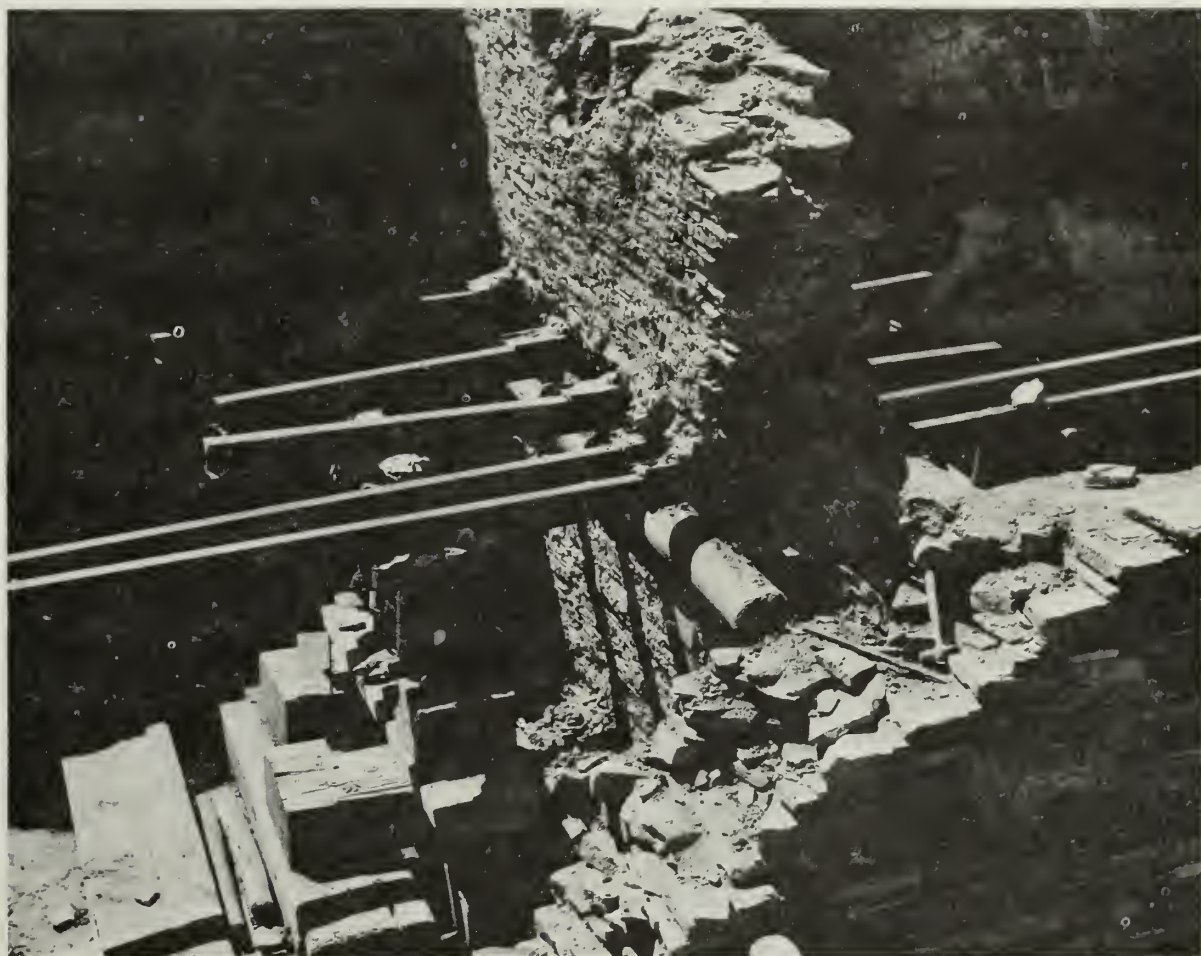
A temporary support. Six steel beams buttress the upper half of the wall while a decayed horizontal timber is replaced. The timber is partly removed here. With care, steel beams can be run through pole sockets or other natural openings without damage to the wall. (Chetro Kettle Ruin, Chaco Canyon National Monument, N. M.)
